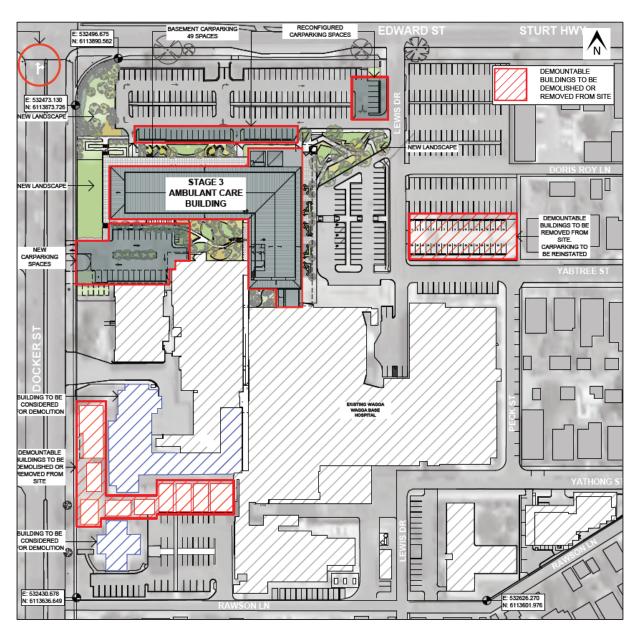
| Stage 3 Site Plan and Demolition Plan (Source: EIS)
